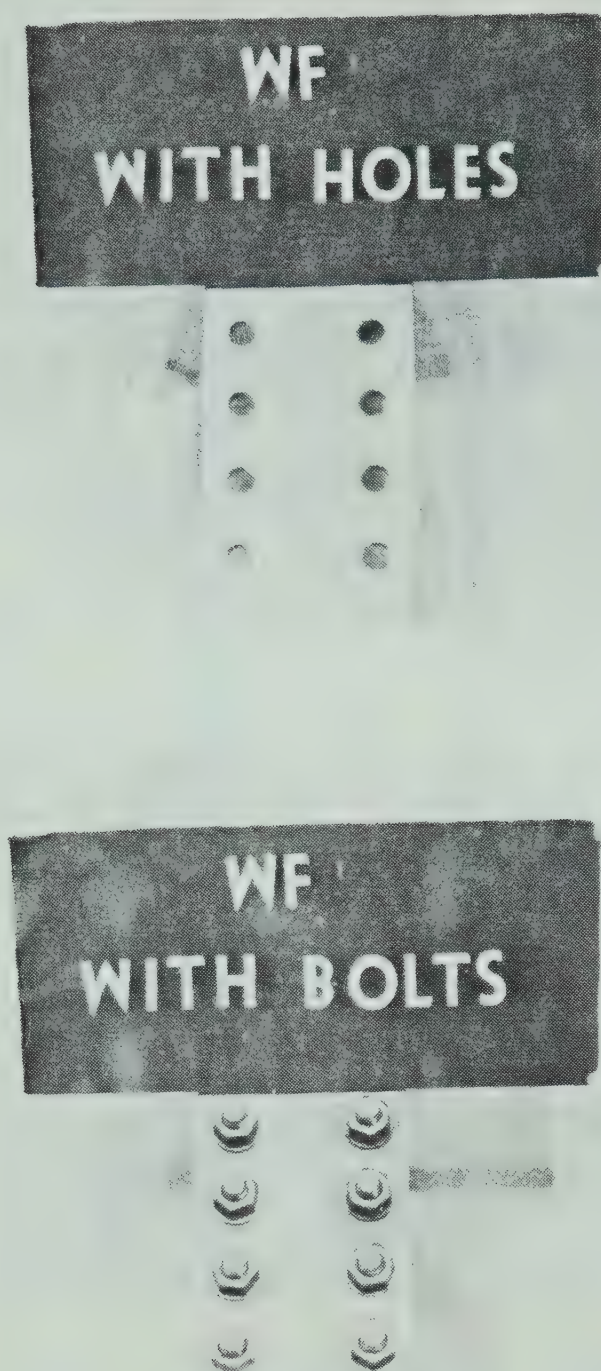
Typical Test Specimens of Beams with Holes and Beams with Bolts
